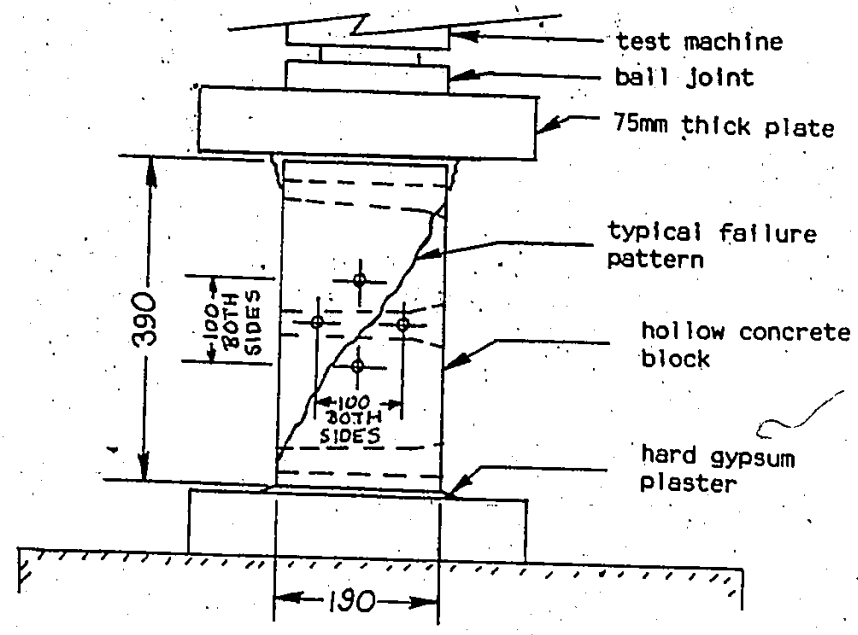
COMPRESSION TEST SET-UP AND FAILURE MODE FOR THE FULL BLOCKS TESTED ENDWISE (Test C5)
